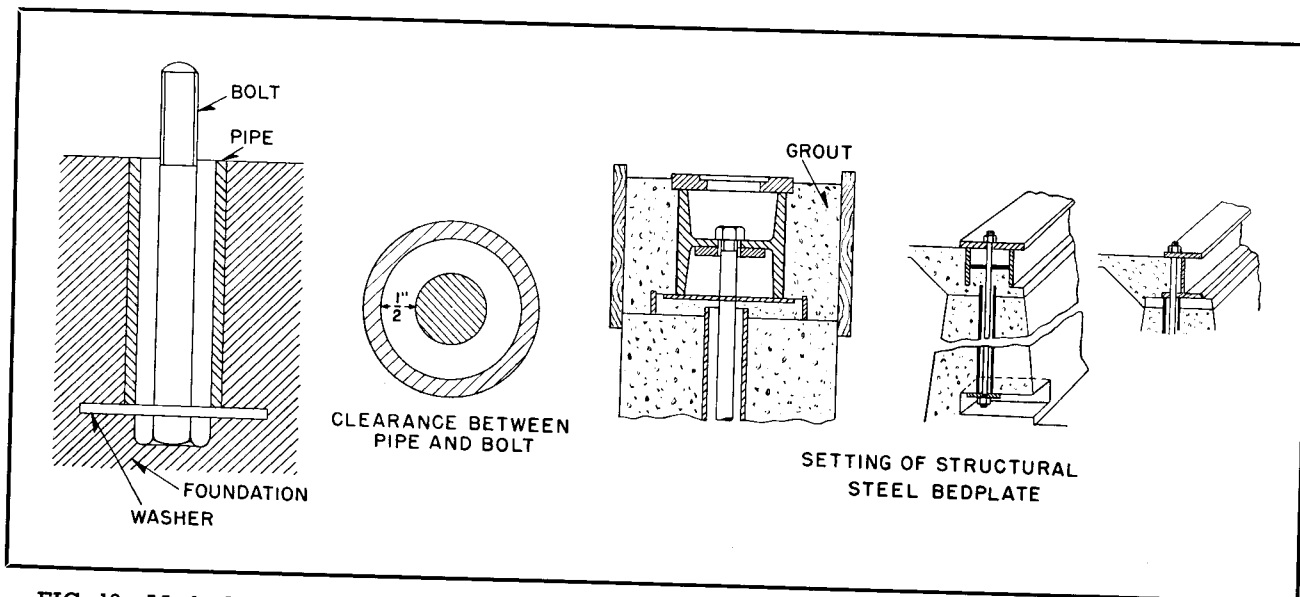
Method of Anchoring Foundation Bolts, and Typical Arrangements of Bedplates and Grout Forms
